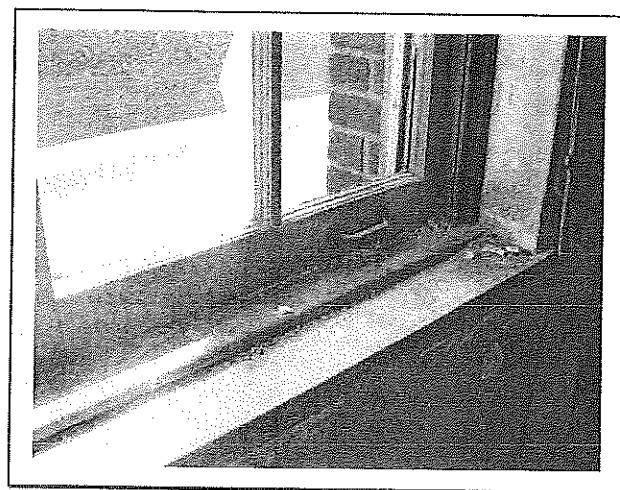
Viewing light gray window sash and sill, Throughout building
